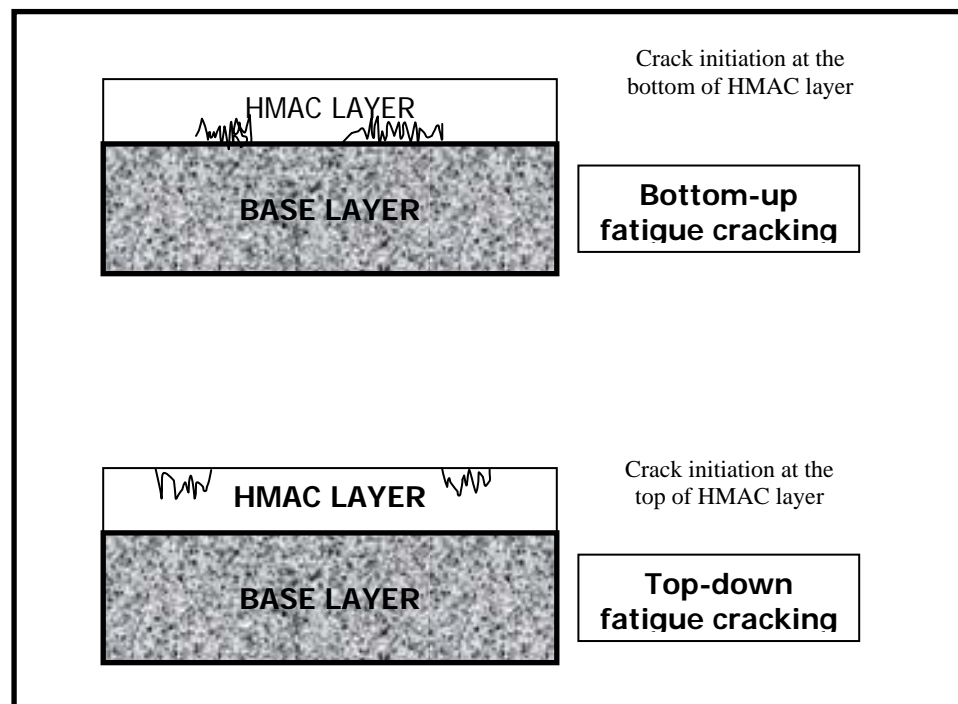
Failure Modes Governing Fatigue Cracking
